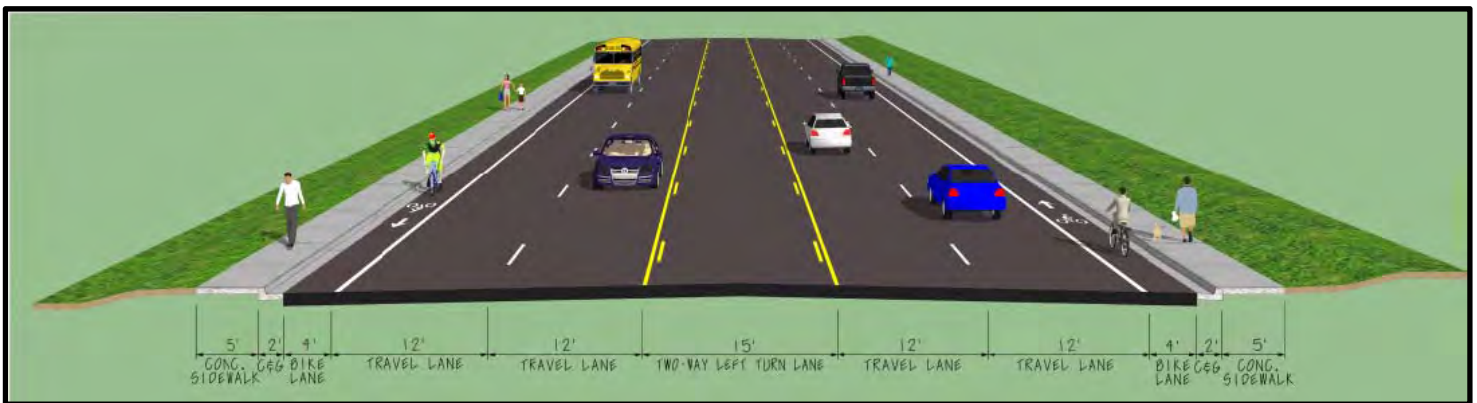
Exhibit A: Standard SCDOT typical section for providing bicycle and pedestrian accommodations
